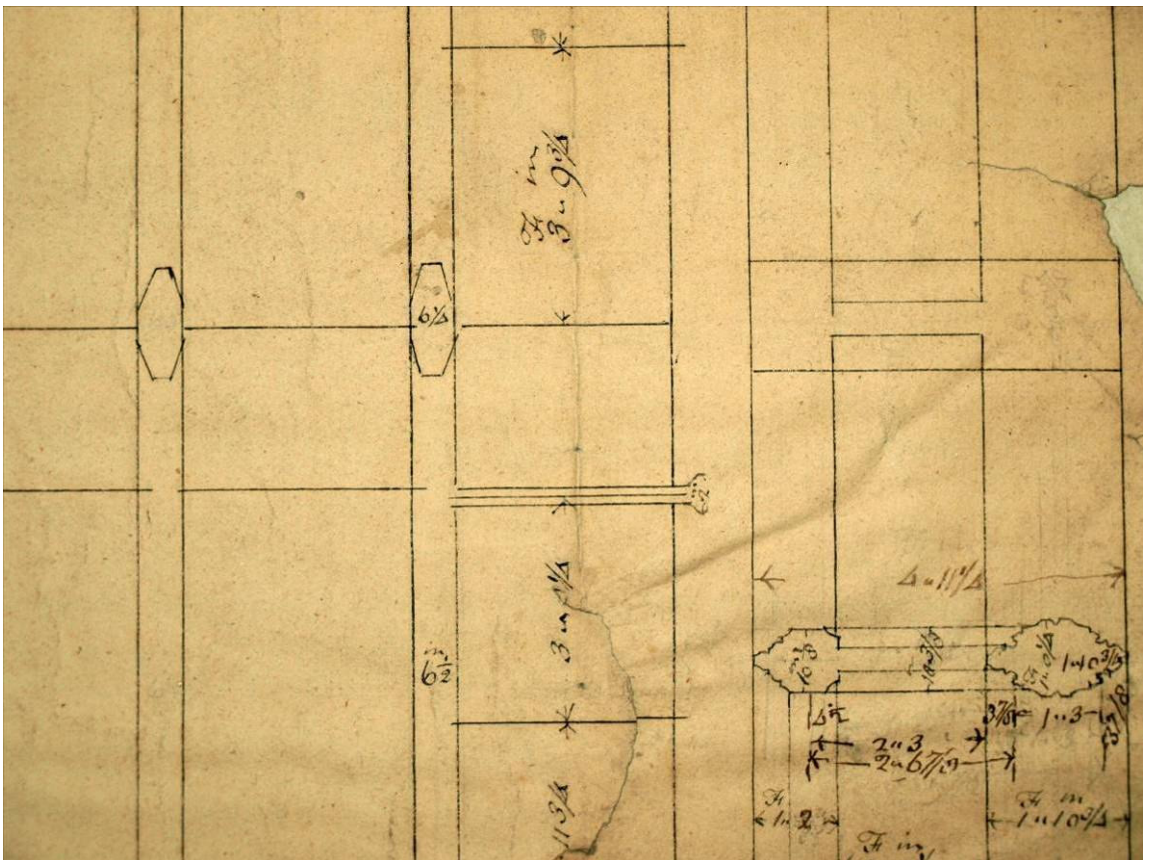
Detail of elevation and sections through transoms and trabeations of Great East Window, William Shout c.1825 (YML/31/290)
